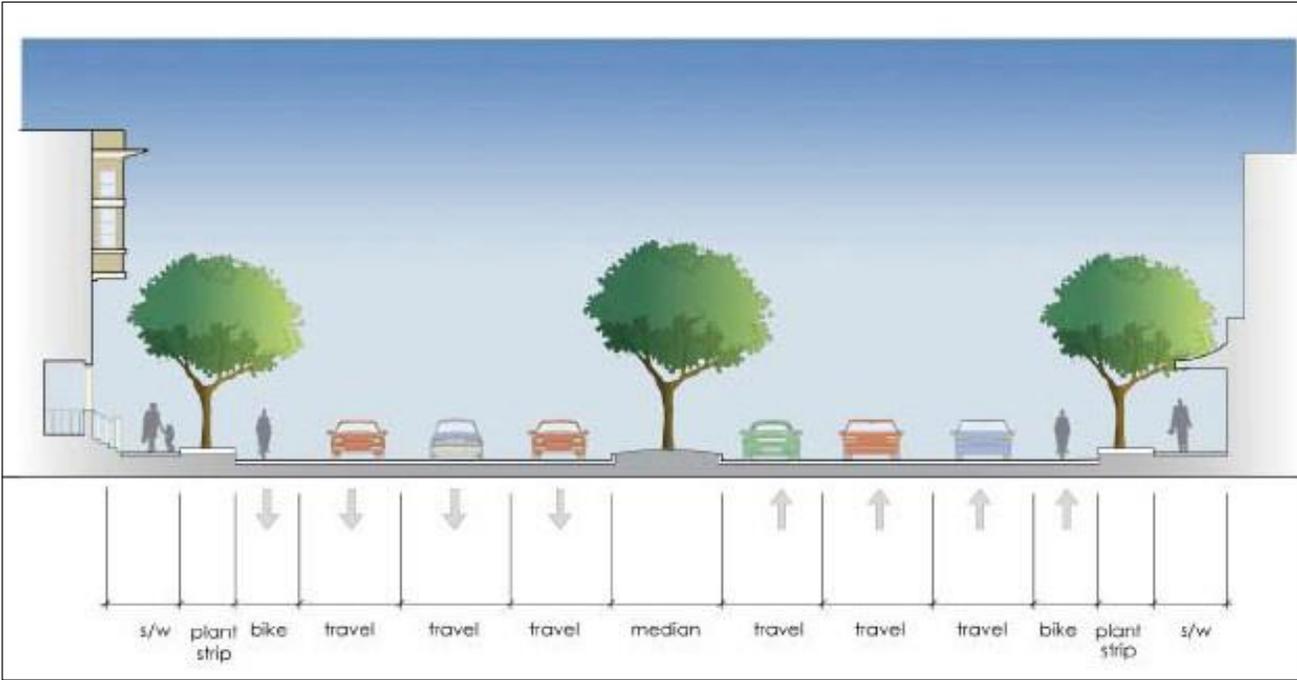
Long-Term Alternative 1, Watt Avenue Section
